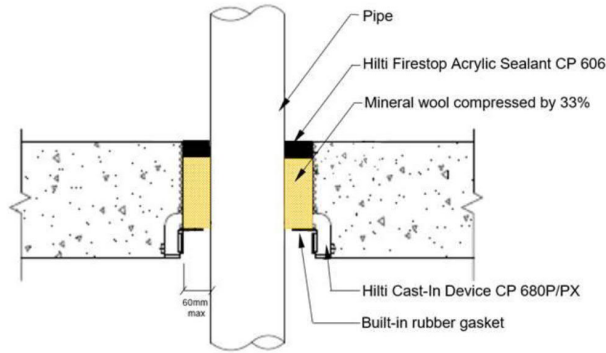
C: Section view – CP 680P/PX cast-in collar in 150 mm concrete slab detail with up to 60 mm annular gap filled with mineral wool with min density of 60 kg/m³ compressed by min 33%
